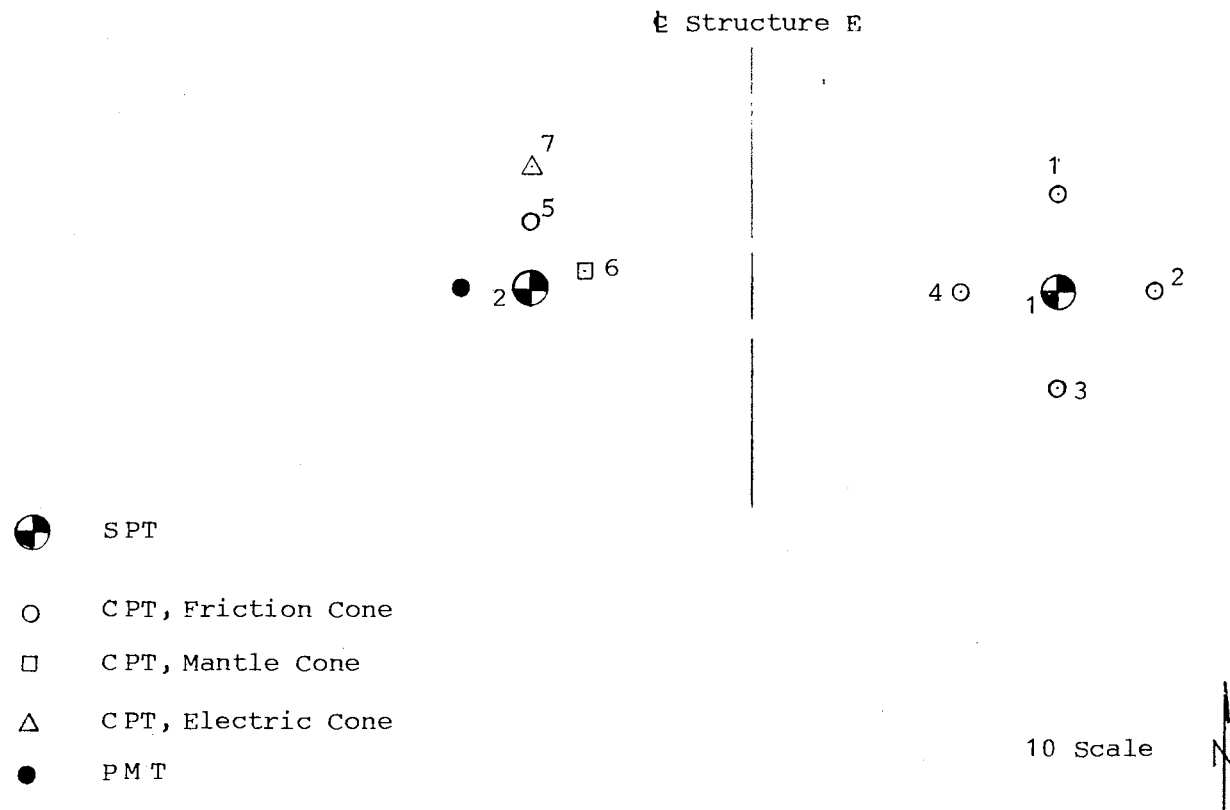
Plan Layout of SPT, CPT, and PMT Locations at Tulsa Site
